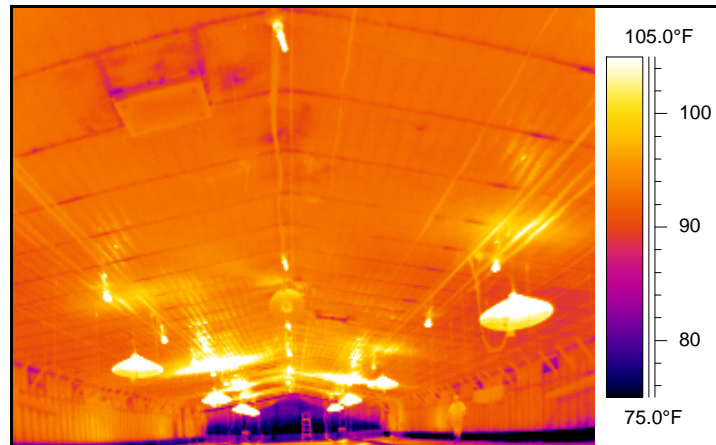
Thermal image of the ceiling of a house equipped with the new attic inlets (attic inlet is in upper left corner).
